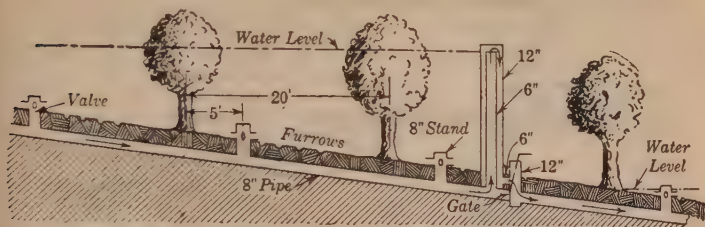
Use of Underground Pipe in Furrow Irrigation, Showing Riser and Stand
